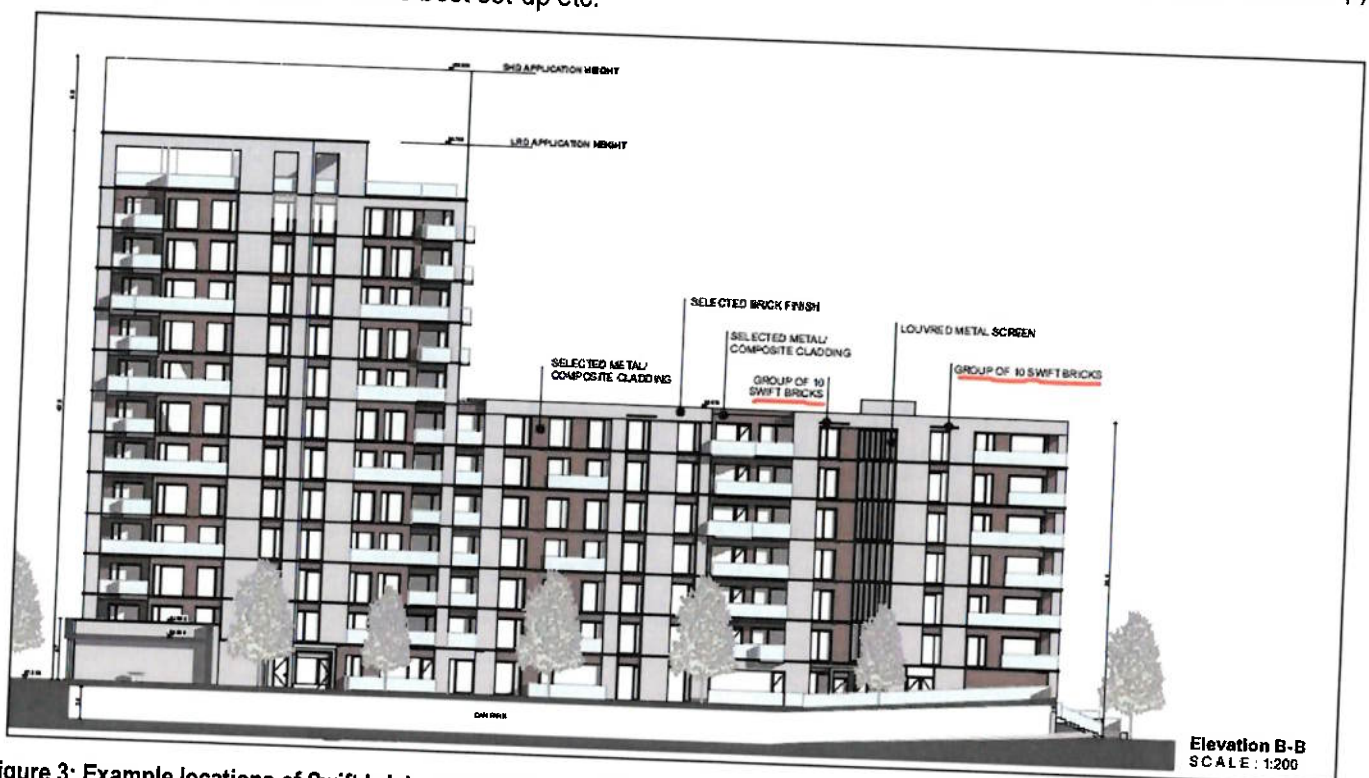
Example locations of Swift bricks on western elevation of Blocks A & B
